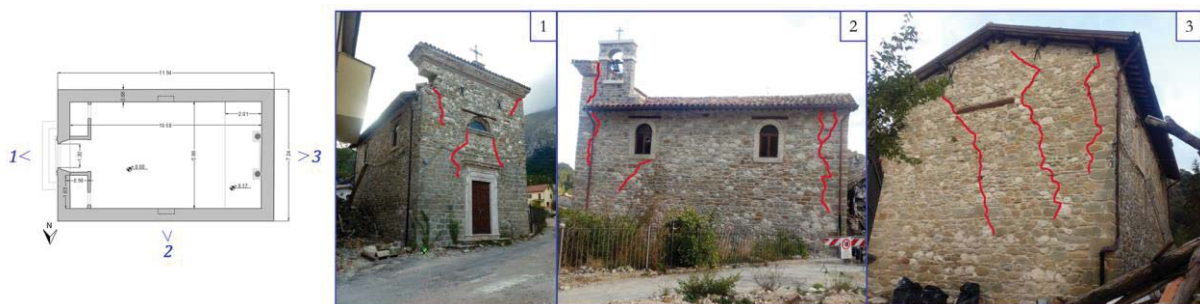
Crack pattern of the Santissimo Crocifisso Church in Pretare (Arquata del Tronto, AP) after the earthquakes of 2016 on 1) the main façade and the 2) North and 3) West facades.
